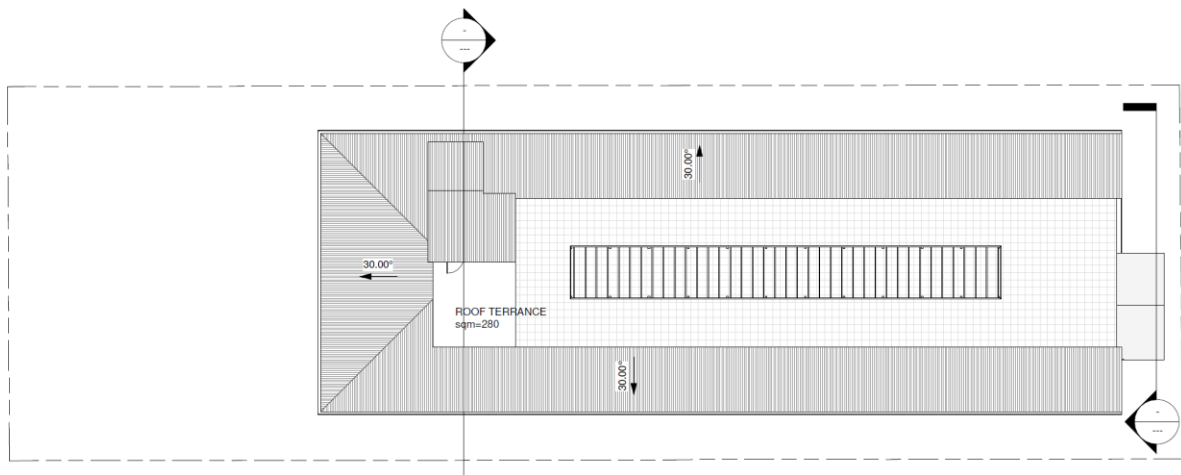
61-63 Bradley St Proposed Roof plan (Source: TLA)
